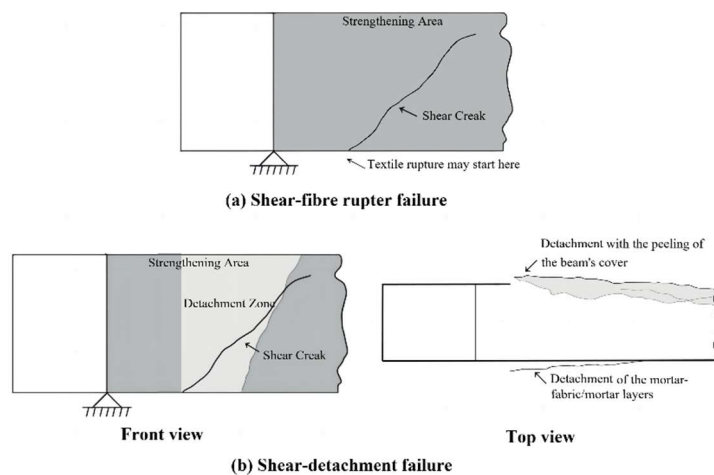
Failure modes: (a) shear-fibre rupture; (b) shear-detachment.
